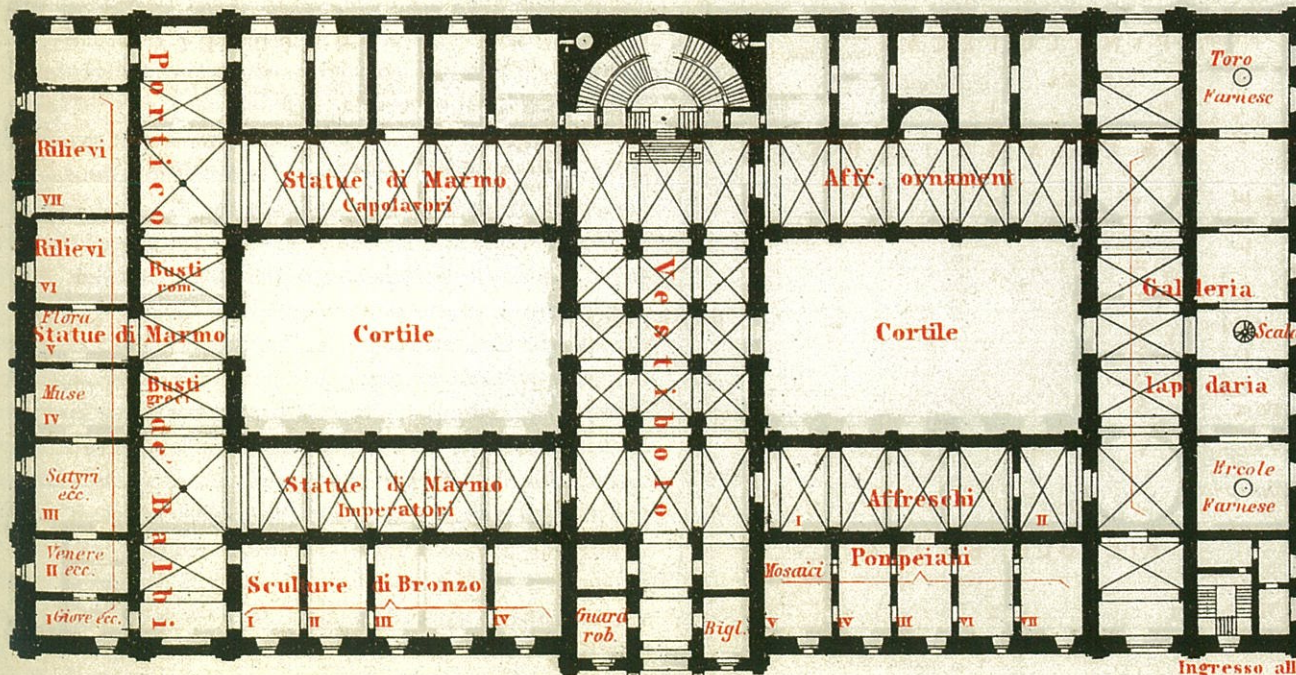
Plan of the ground floor of the Naples museum showing galleries devoted to Venus and satyrs at front left. In Karl Baedeker, *Italie* (see fig. 43), opposite p. 77.
